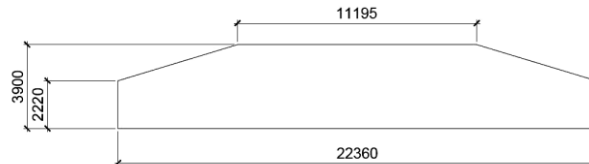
Suggested cross sectional diagram of poultry house structural dimensions
